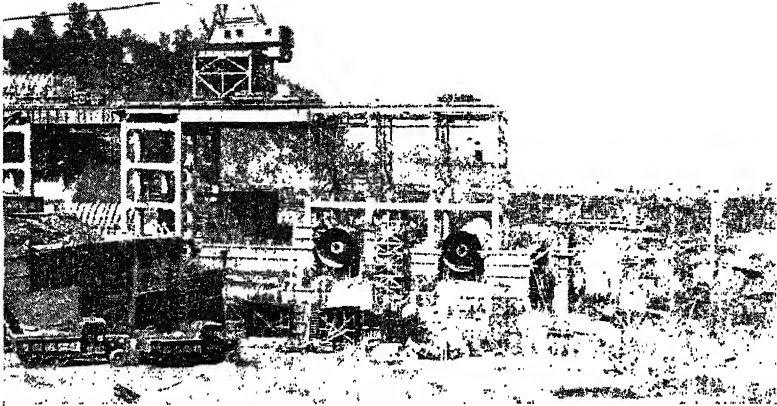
North end of construction bridge. Note towers clearing penstocks. The two towers at left are of reinforced concrete for the full height, the others are part concrete and part structural steel.
